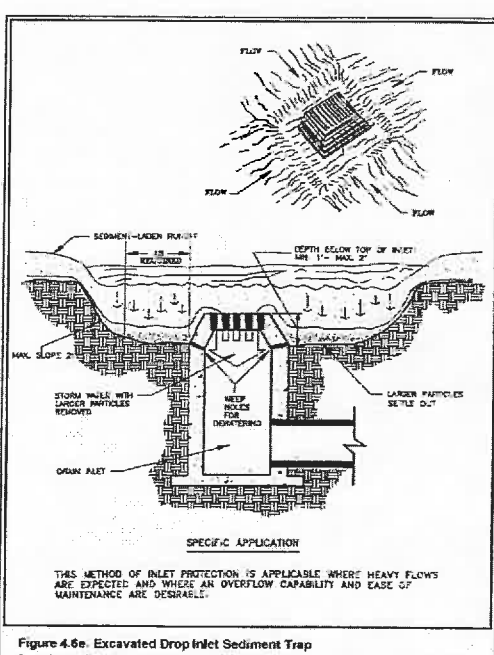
Excavated Drop Inlet Sediment Trap
